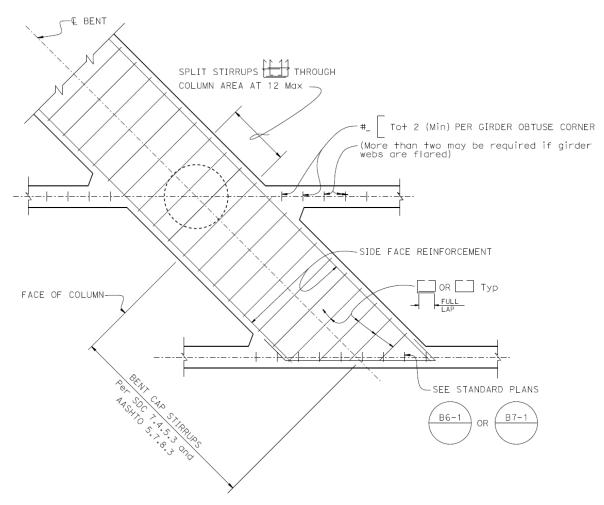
Stirrup Reinforcement at Skewed Bent Caps (Greater than 20° Skew)
